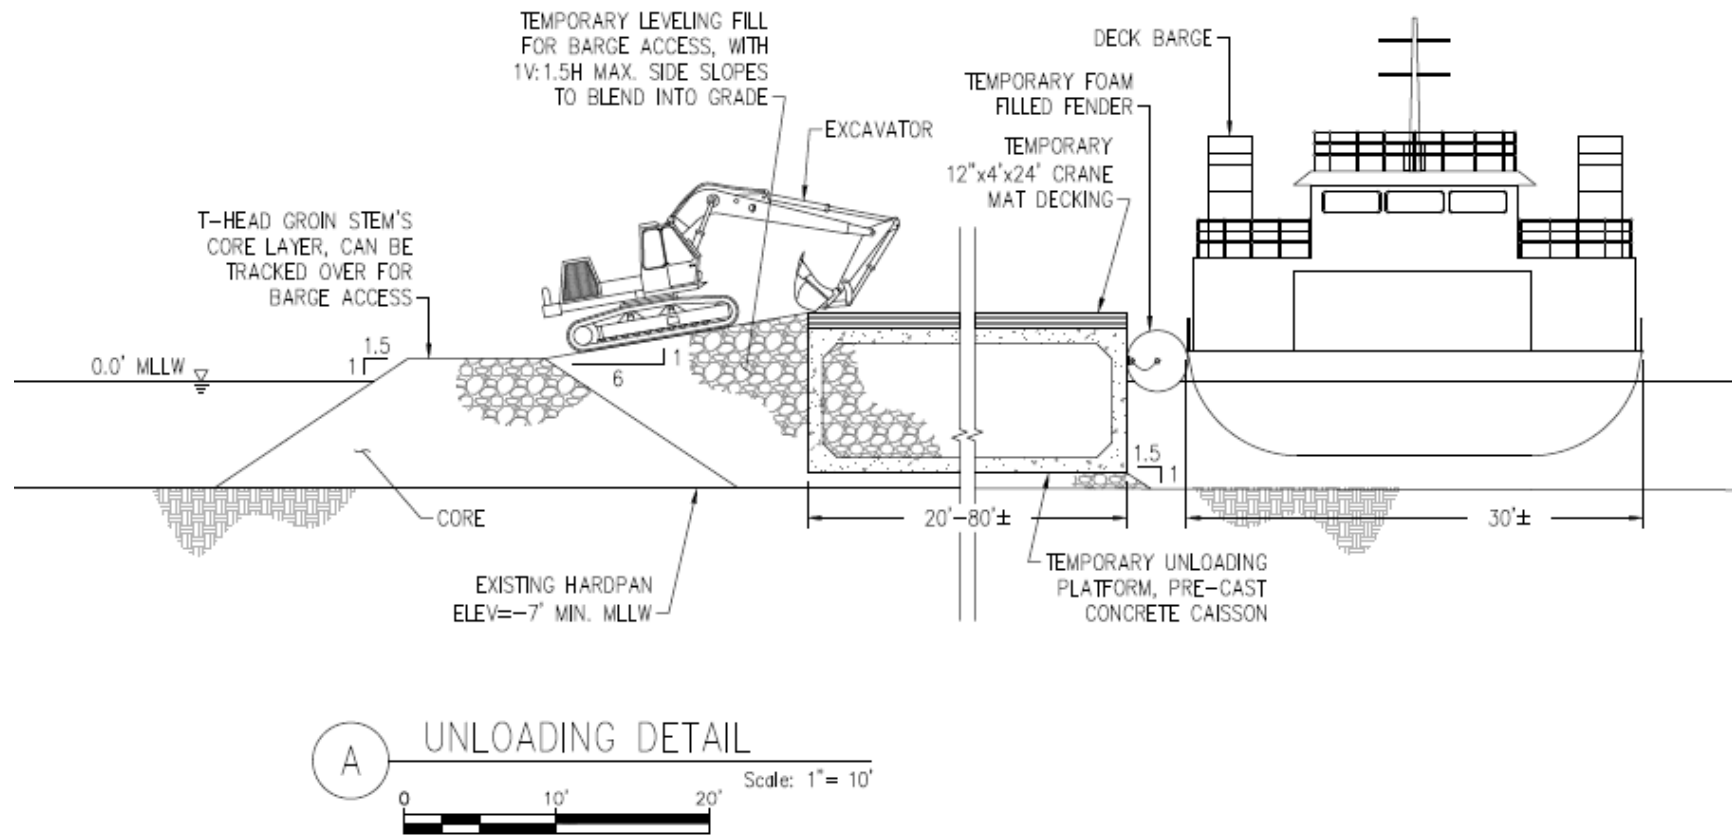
Proposed Construction Method - Detail of Barge Route
